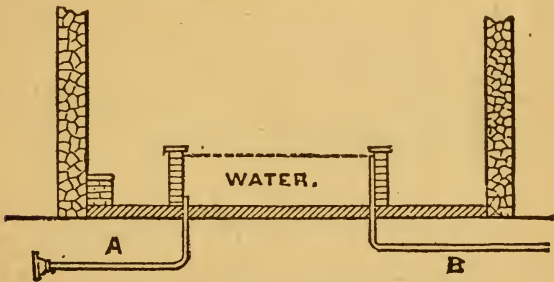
MILK-HOUSE WITH RAISED TANK.
